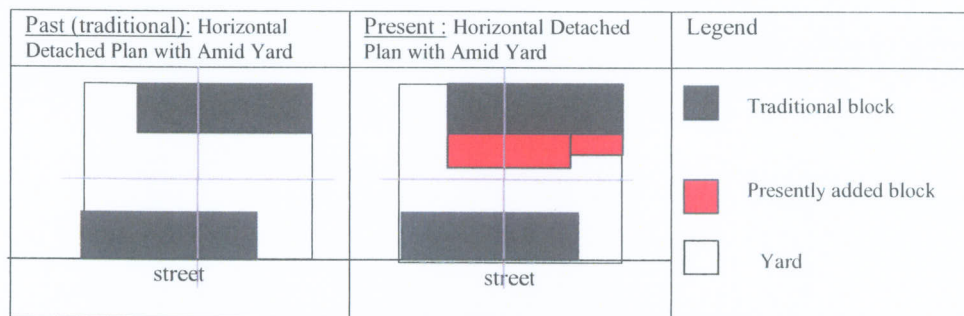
Horizontal Detached Plan with Amid Yard (Author,2012)
